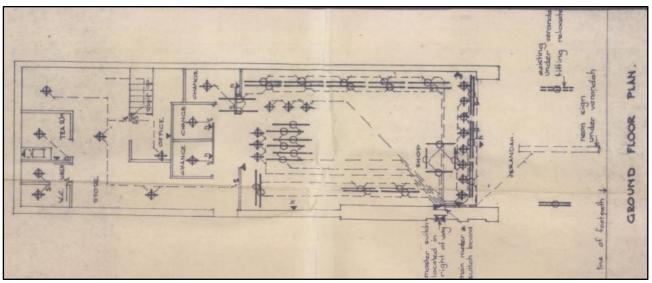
Detail from 1964 plan, showing alterations to the floor plan of the building at 7 Dee Street (E R Garden & Associates, 1964).
